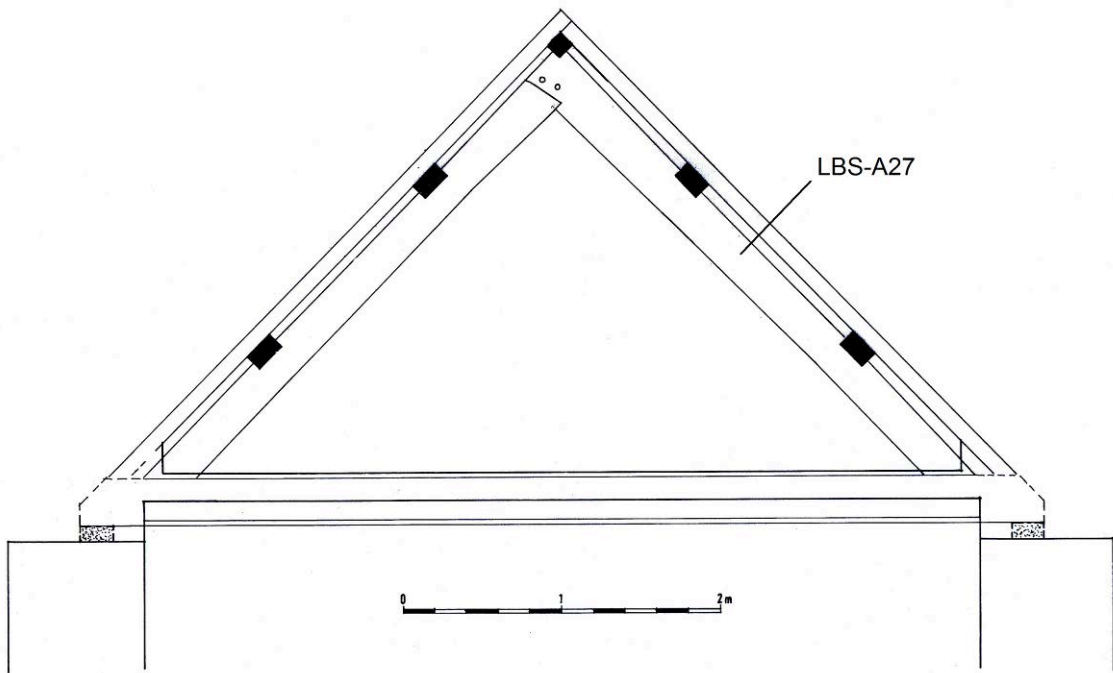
Central hall/parlour range; truss 2 (east face), showing the location of sample LBS-A27 (Martin Roberts)
